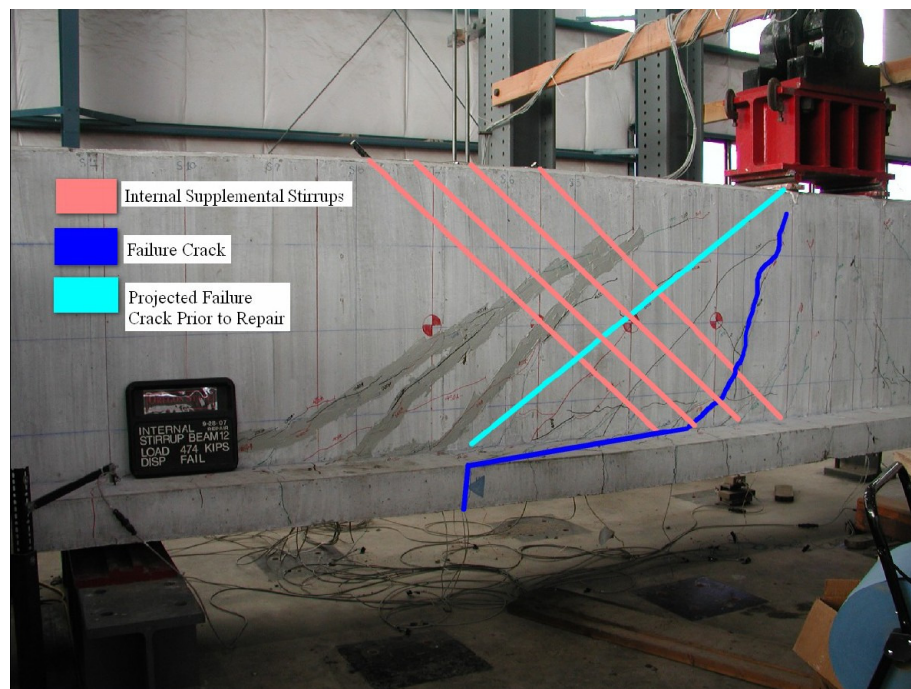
Specimen B.IT.C.IS failure crack projection and actual location
